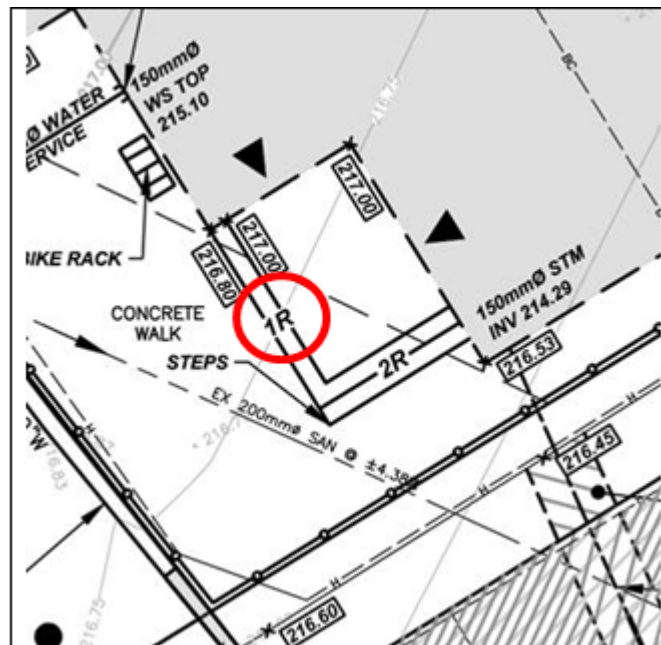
Remove 1 riser and replace with either ramp or place a railing along this edge
